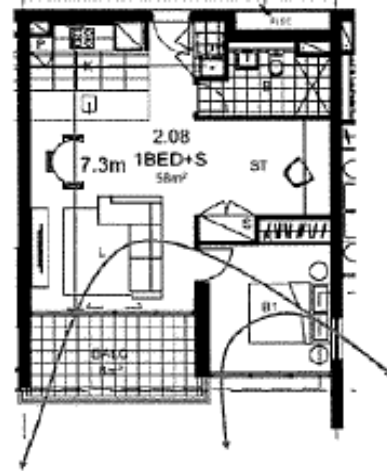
Typical cross ventilation details for units 1.08 (and above) and 13.06.
